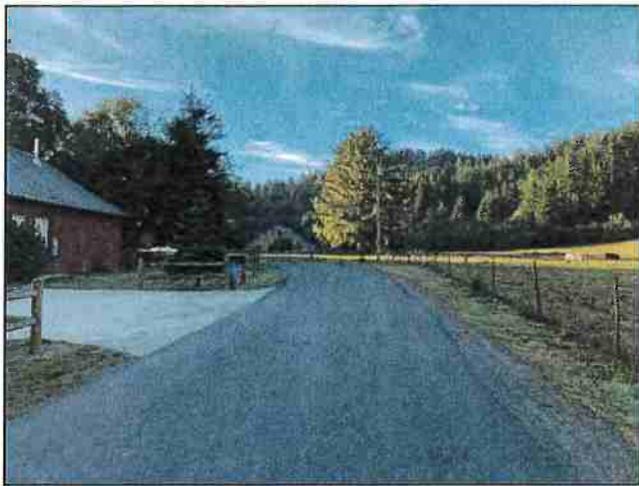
Williams Creek Rd Looking SE @ First Driveway South of Grizzly Bluff Rd
